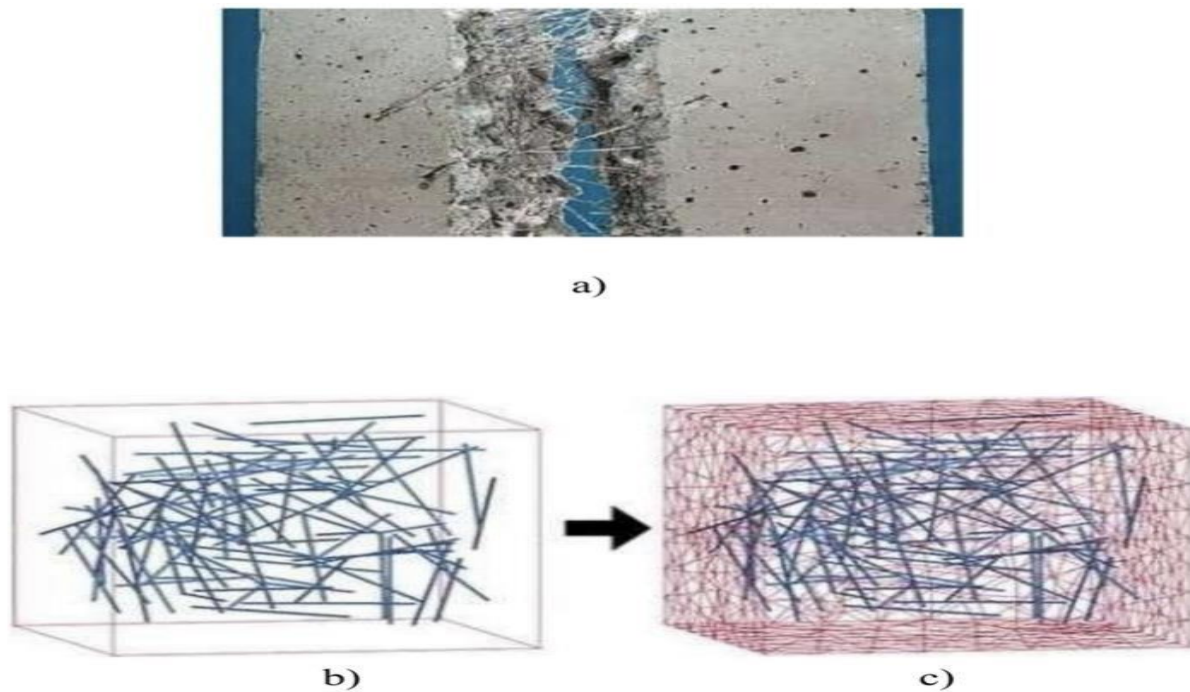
FIG-Fibre Reinforced Concrete (FRC)-8-(A, B, C)
